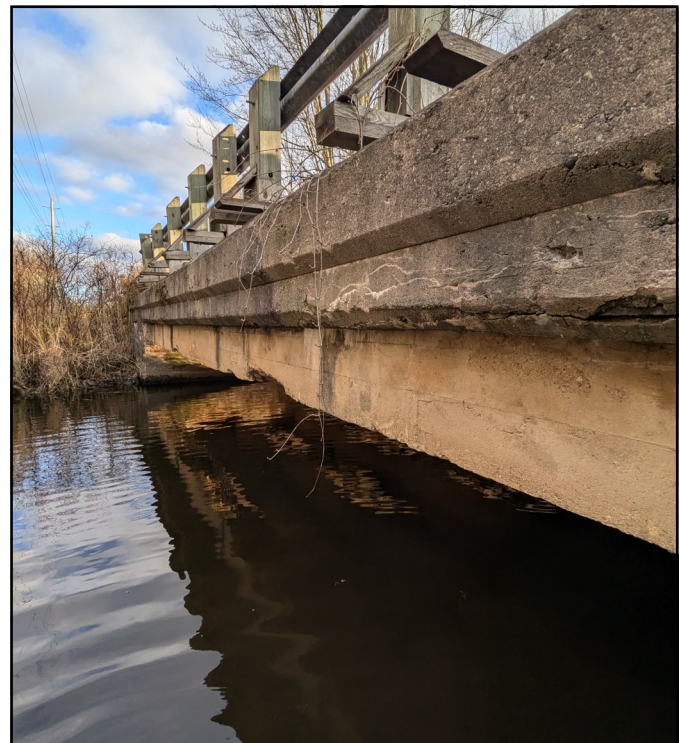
View of Southwest Wingwall of Original Structure.
